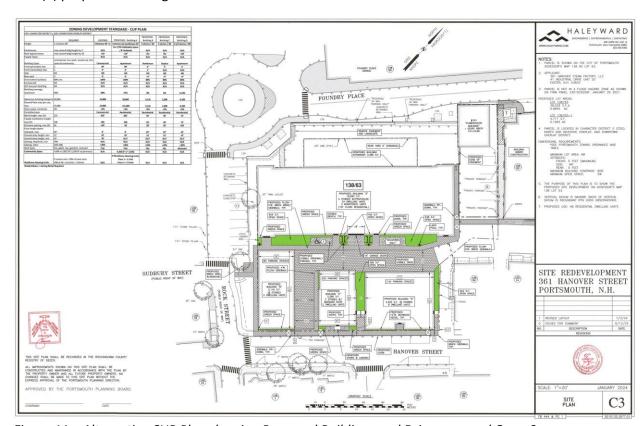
Alternative CUP Plan showing Proposed Buildings and Driveways and Open Space
